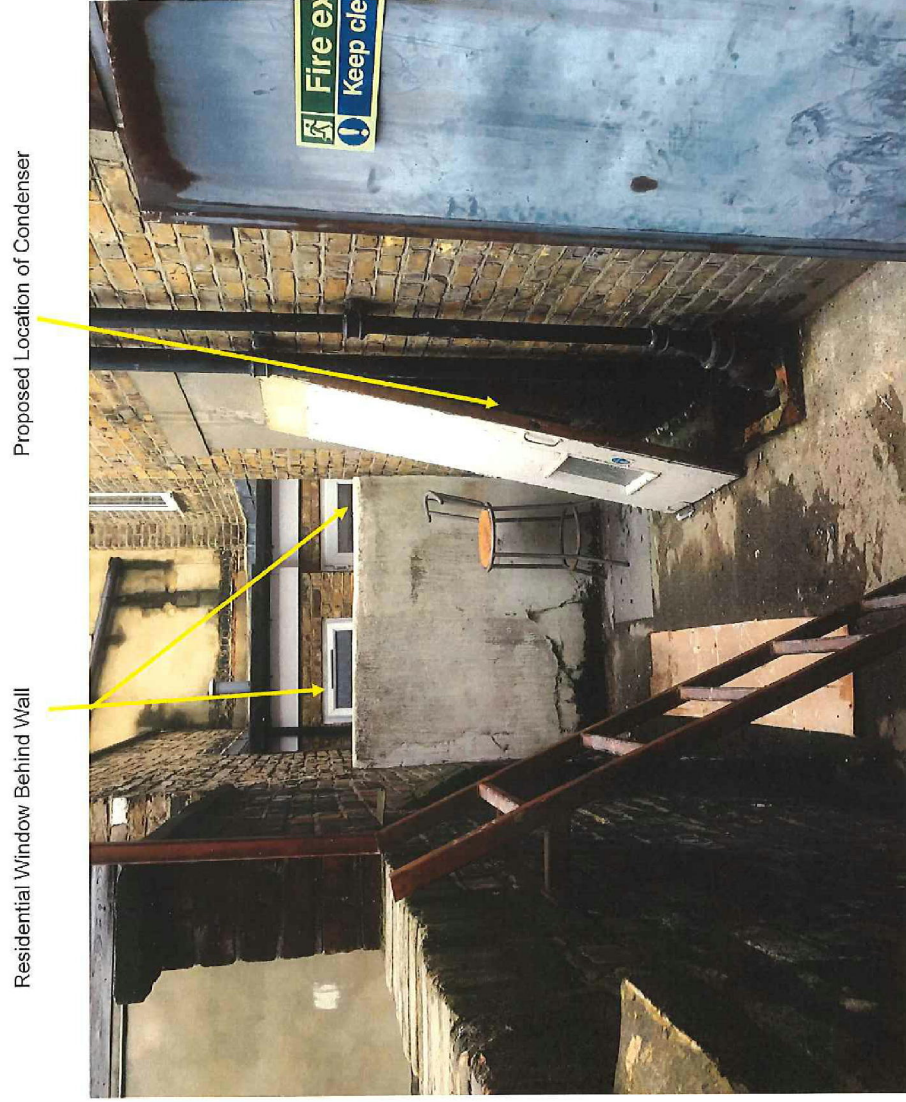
Photo B – Rear Ground/Basement Level Courtyard with Residential Windows Behind Wall
